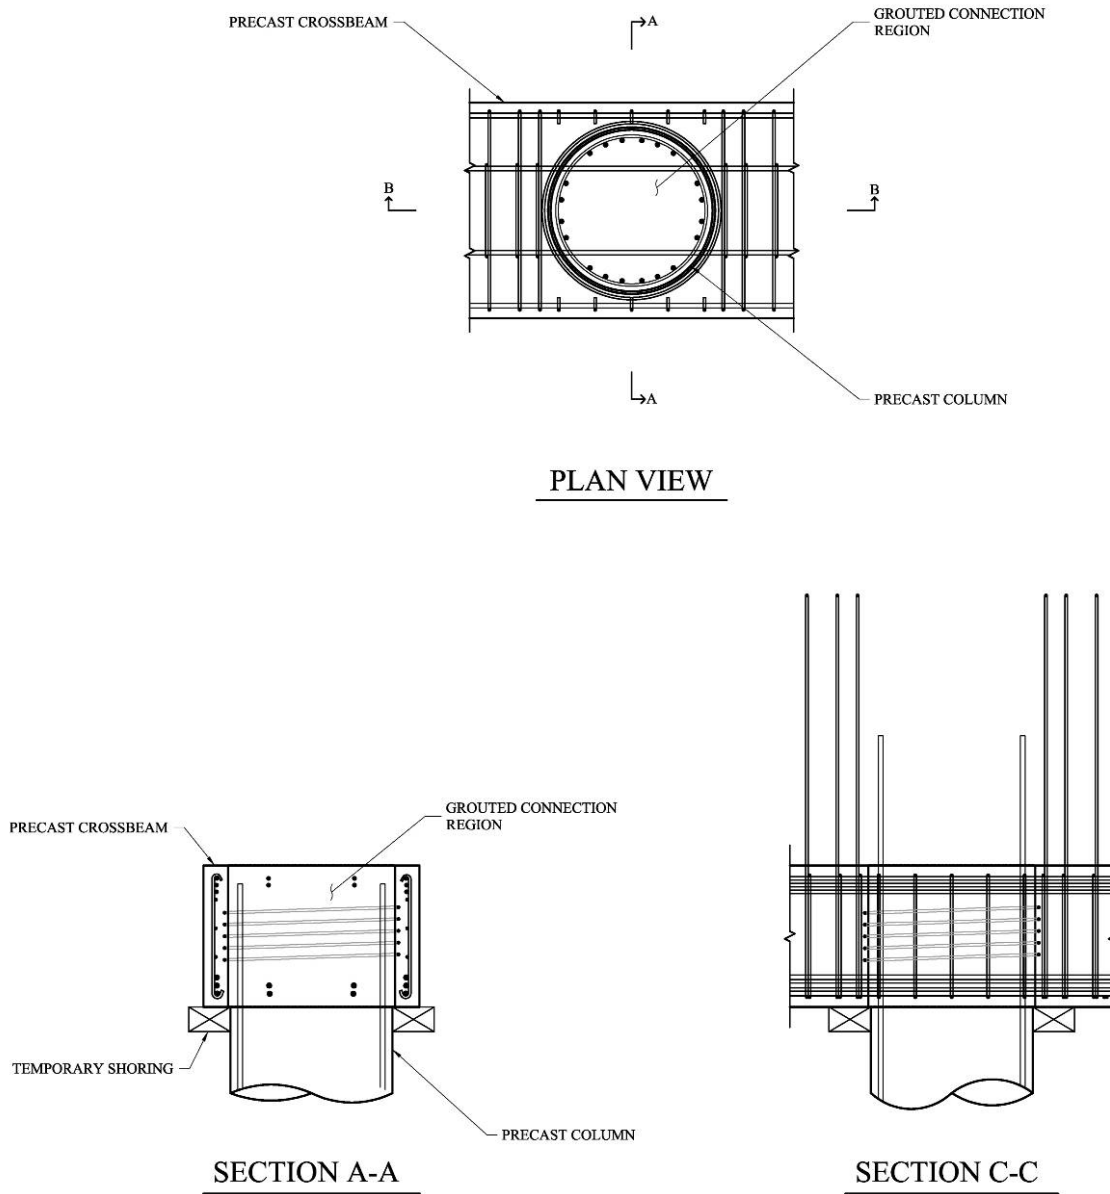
Column and Cap-Beam for Complete Opening Connection for Reinforced Concrete Frames
